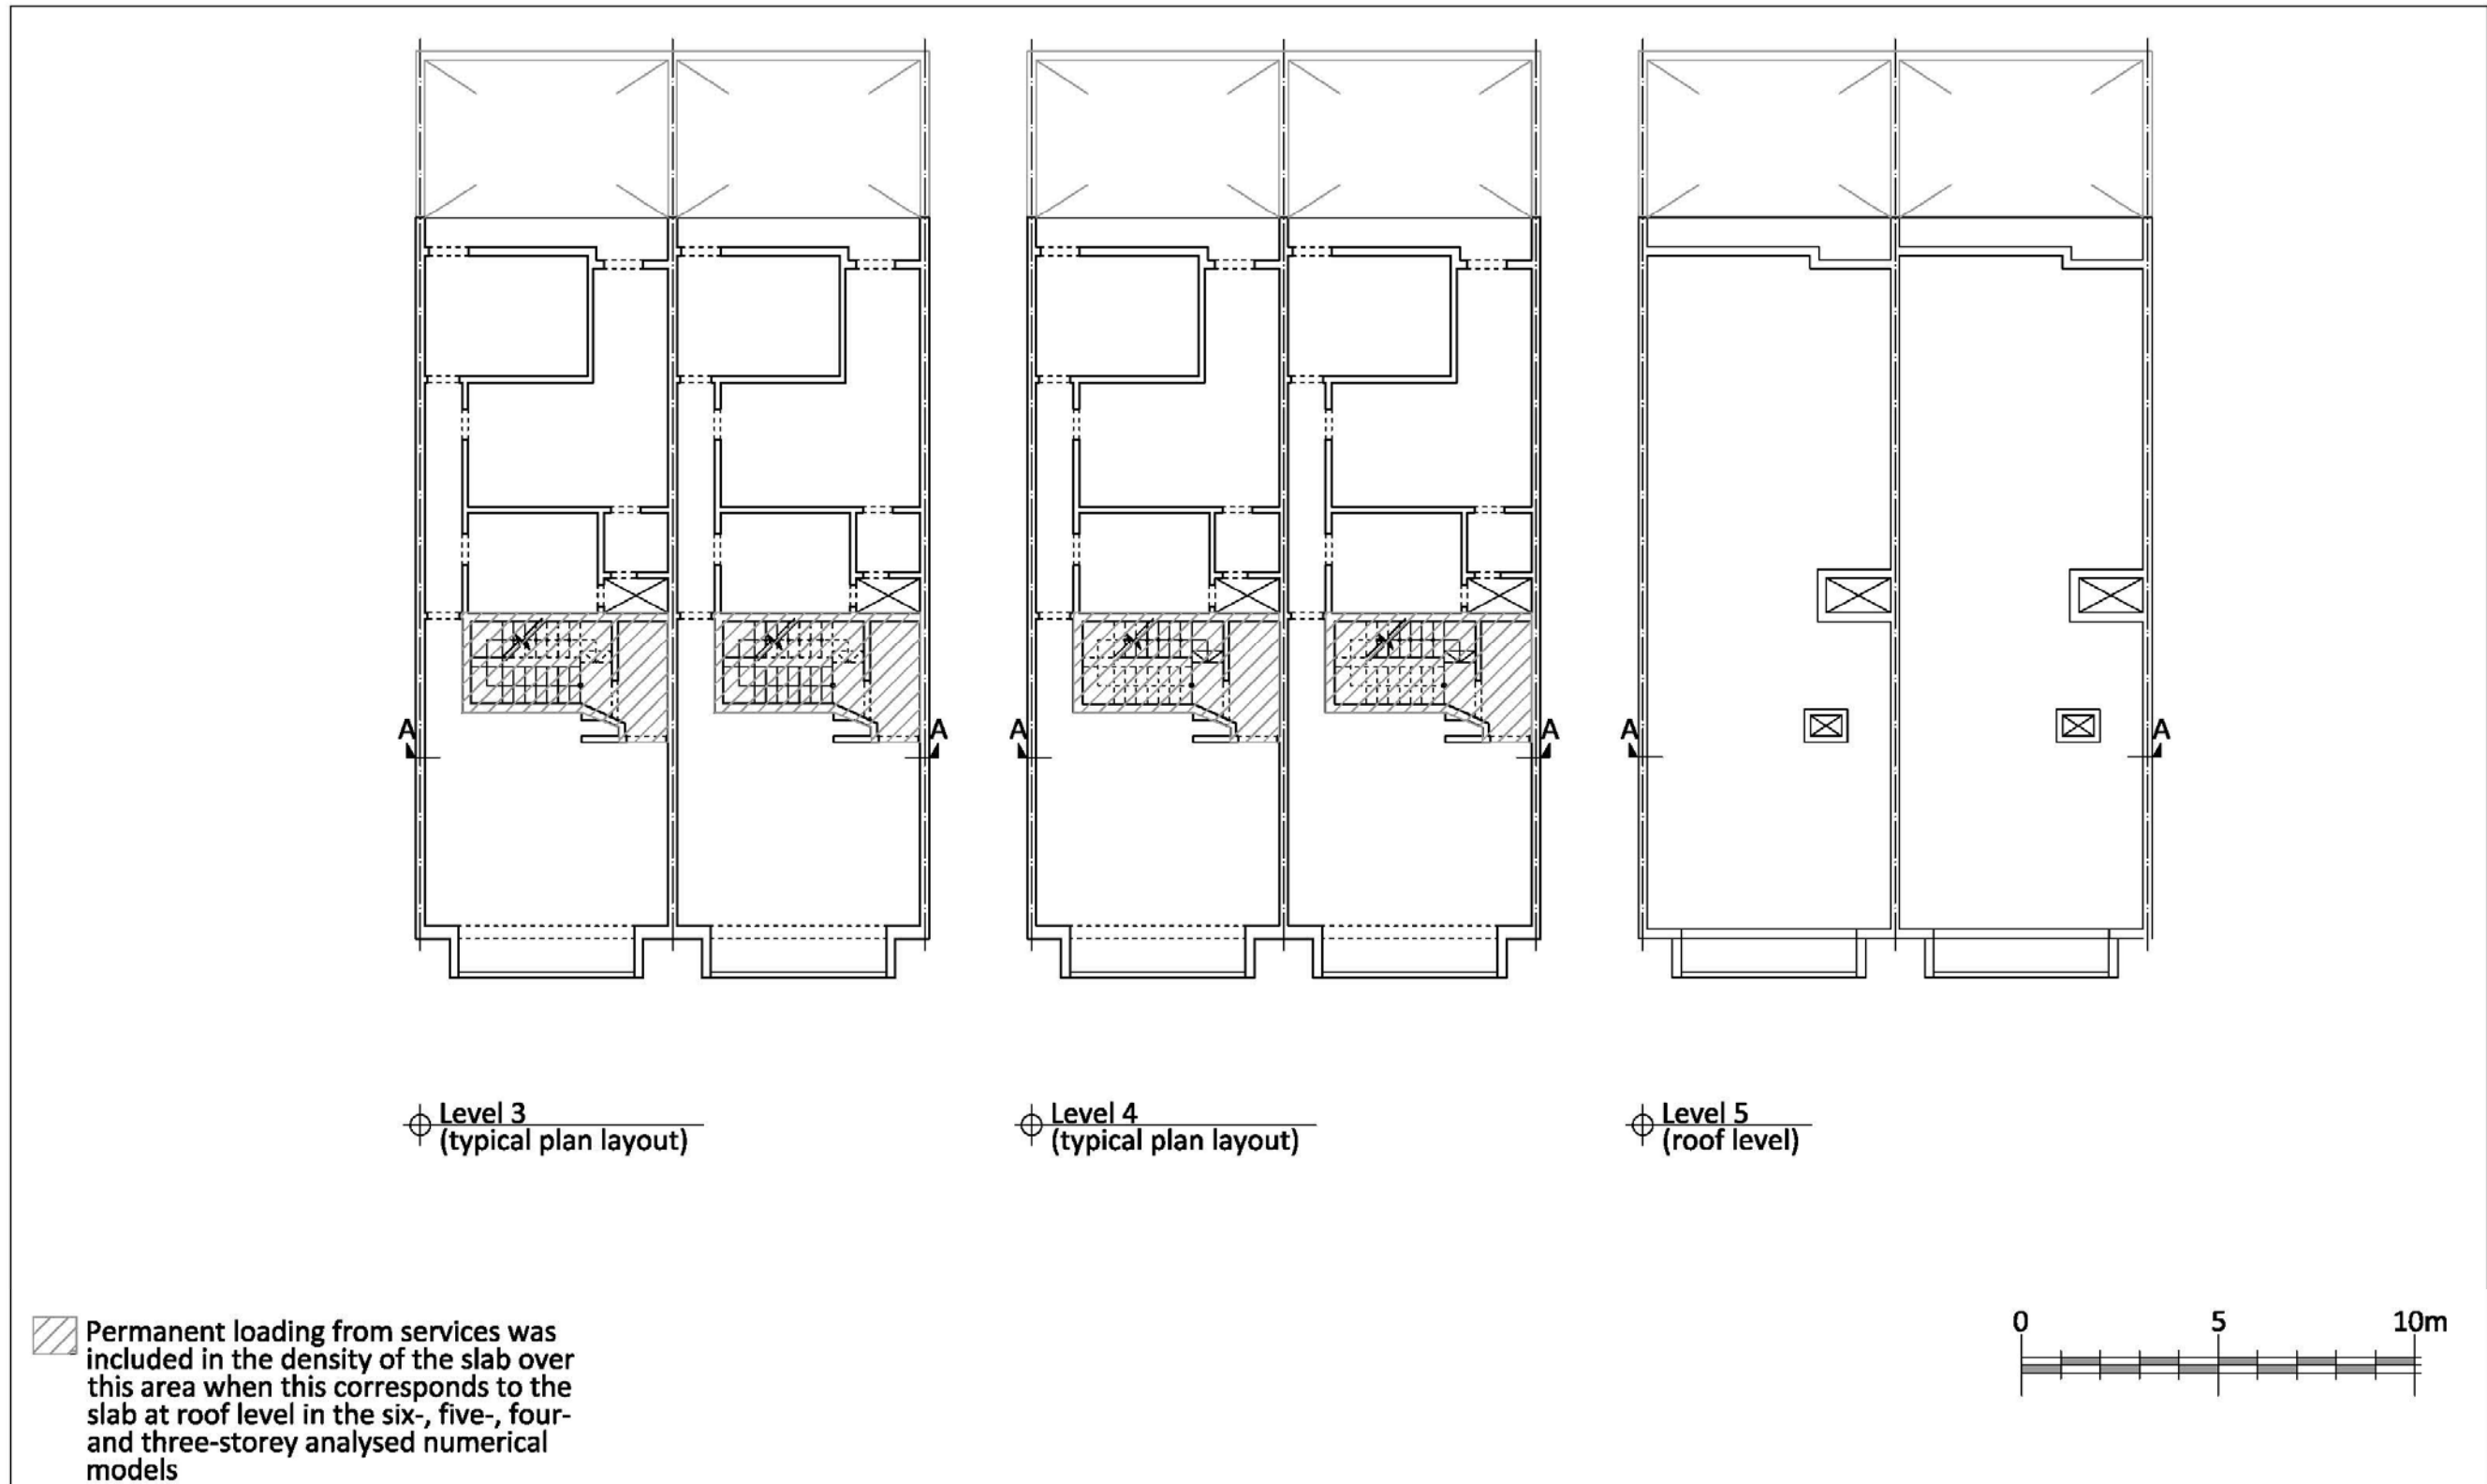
Plan layouts at Levels 3 to 5 for analysed two-building control numerical models (plan length-to-width ratio 1.37:1).
